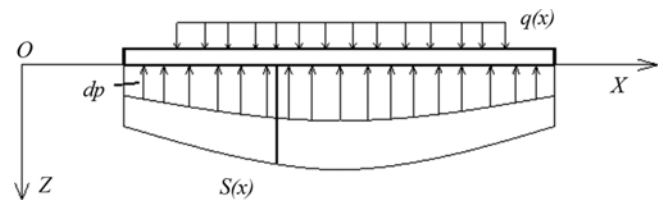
Calculation Diagram of Infinite Beam on Winkler Foundation
